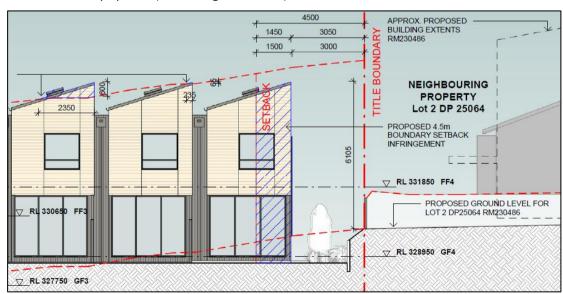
Site plan showing building location and setback encroachment hashed in blue.
